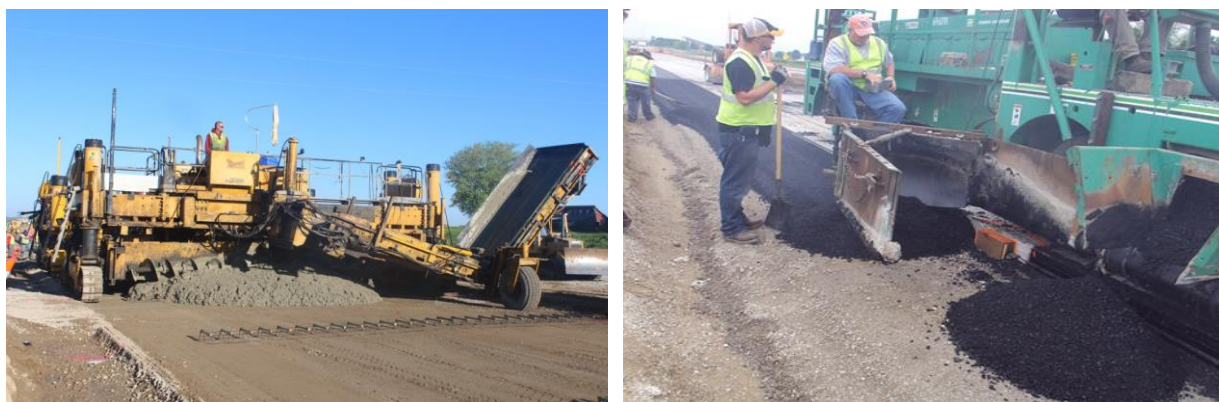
Site 1 pavement construction: PCC placement (left) and shoulder paving (right)
